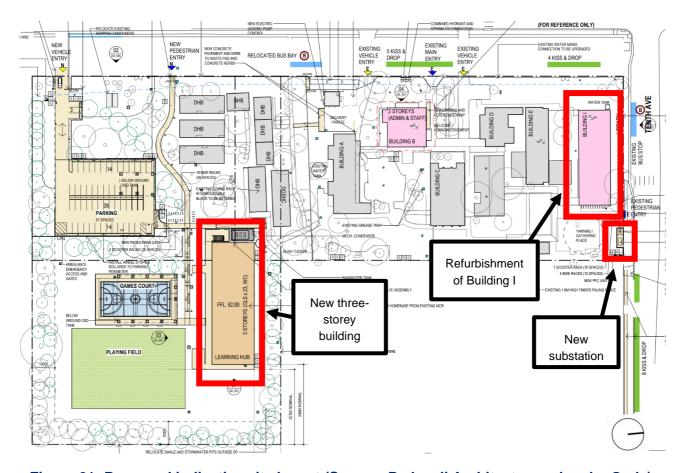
Proposed indicative site layout (Source: Pedavoli Architects, markup by Gyde)
